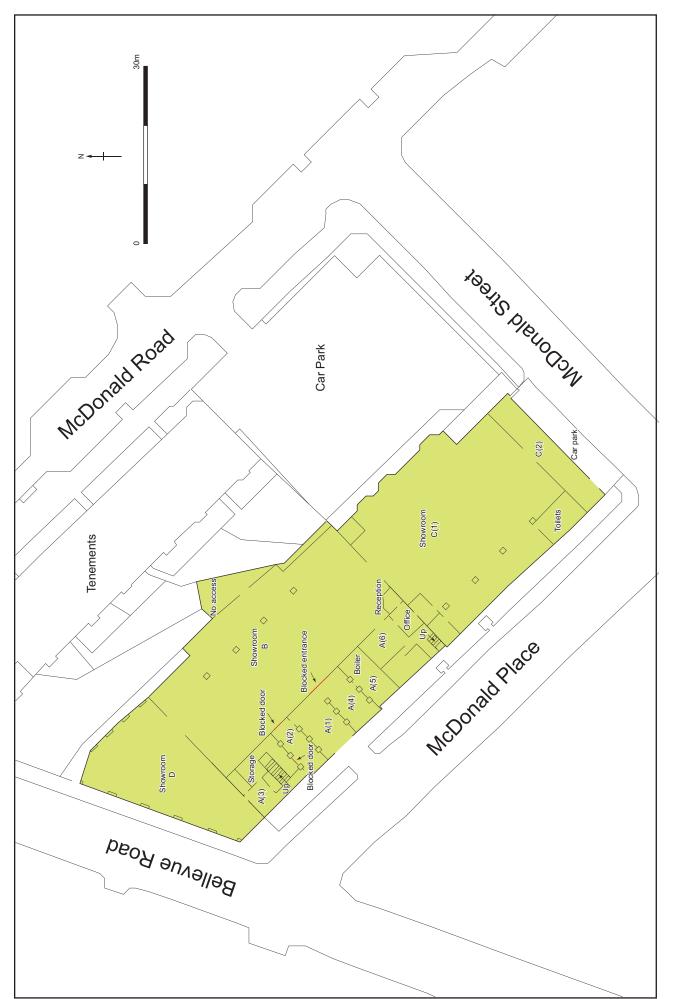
MDE07: Ground floor plan of Crawford's Bakery, 2007.
